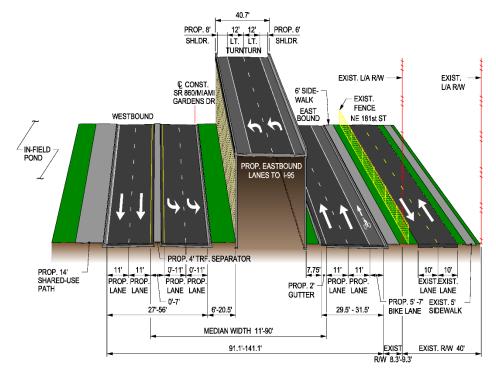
13: Proposed Typical Section - Alternative 3 – SR 860/Miami Gardens
